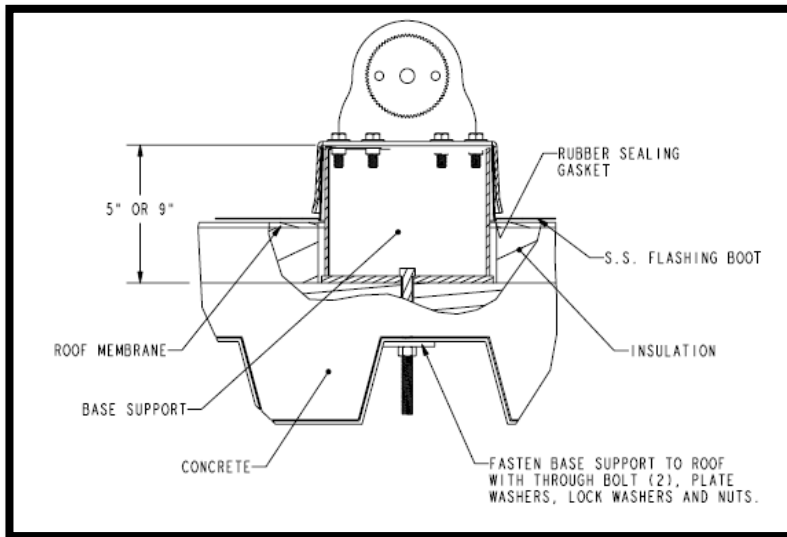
SLAB-ON-DECK ATTACHMENT SECTION DETAIL
